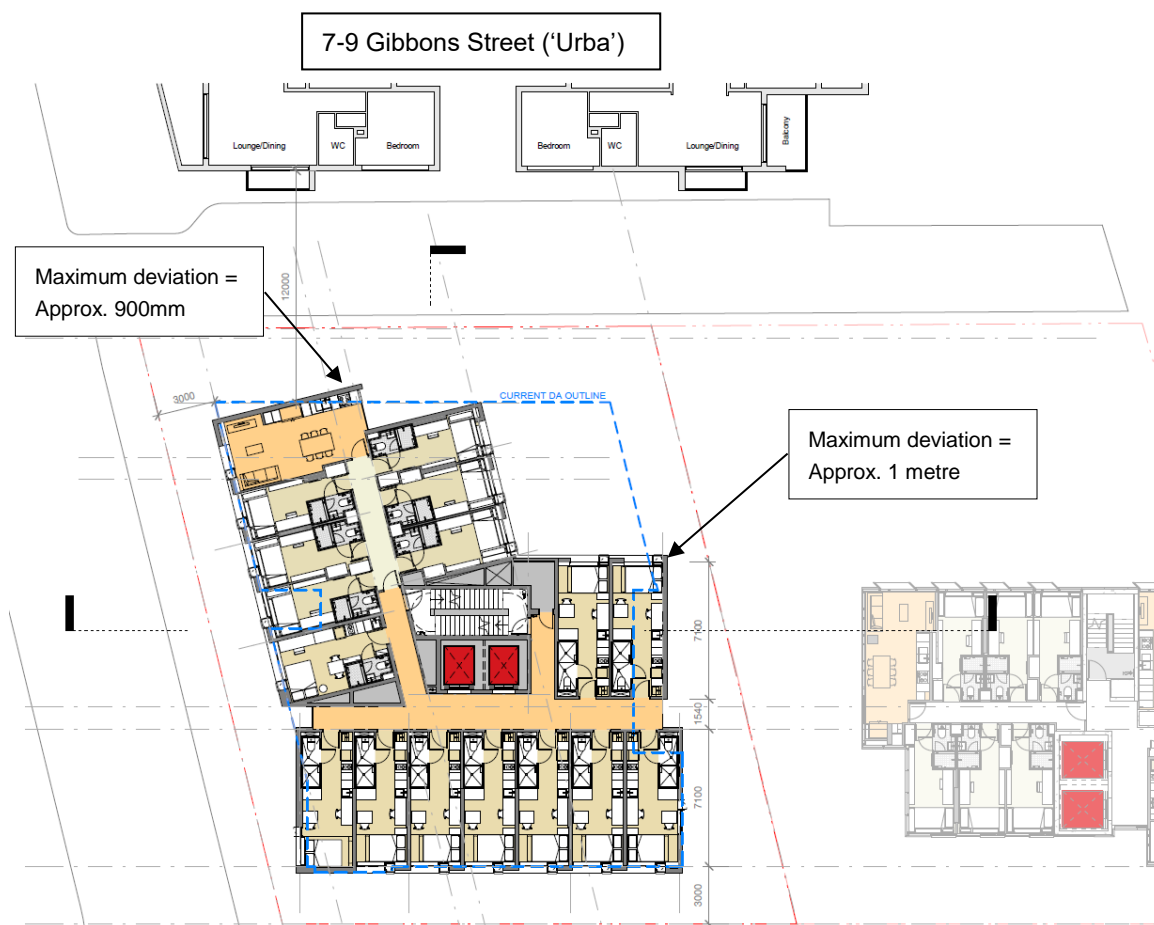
Extract from proposed architectural plans (typical tower floorplate)
